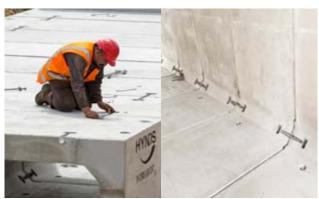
Place threaded rod connecting set in groove. Tighten nuts equally at each end, using a socket wrench to a maximum torque of: Ø16 set: 100 Nm; Ø20 set: 125 Nm; Ø24 set: 150 Nm
